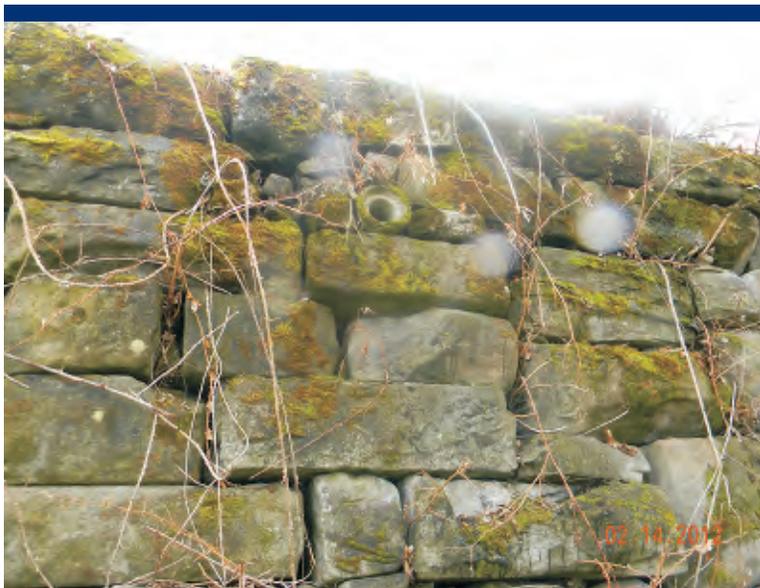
Concrete pipe opening in retaining wall at 2105 Tacoma Avenue South (former gas station).
